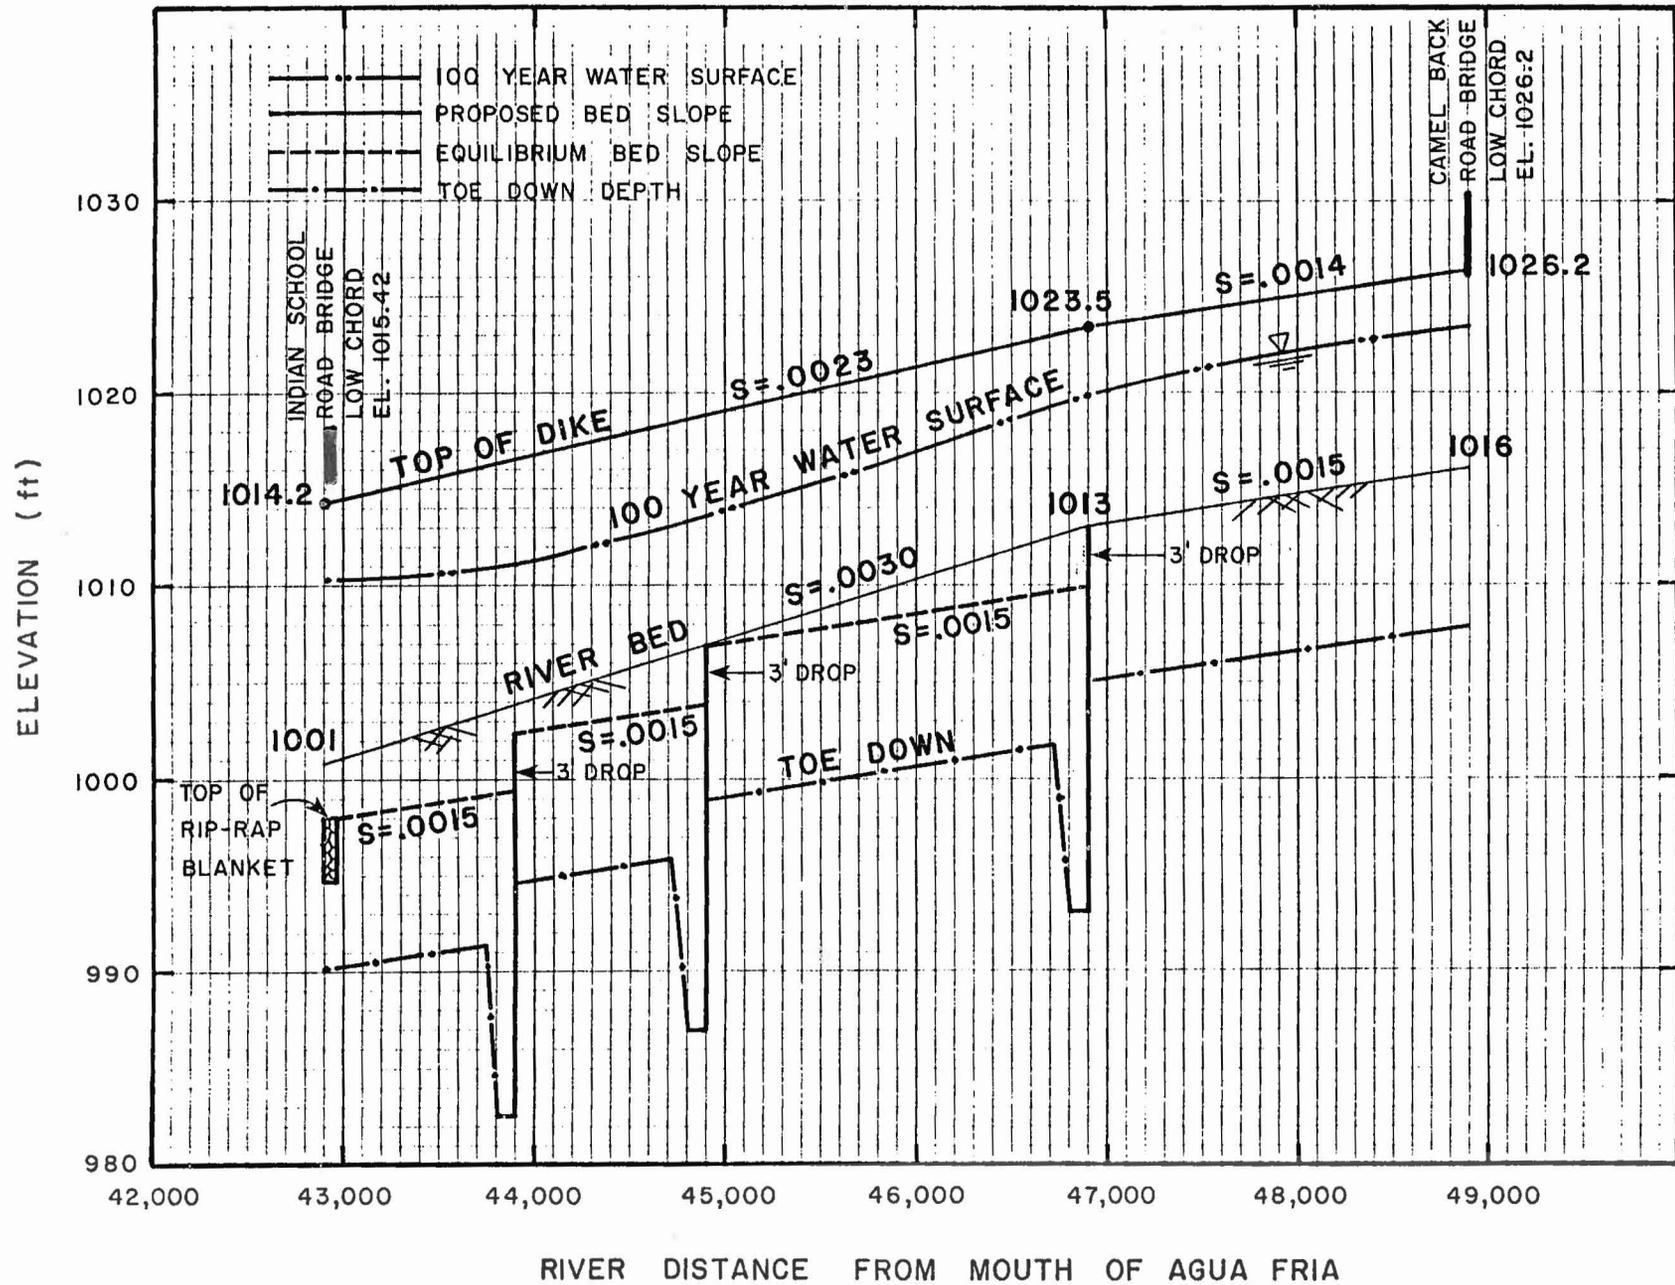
Proposed bed profile, equilibrium bed profile, 100-year water surface elevation, levee heights and toe down depths between Camelback Road and ISRB for Alternative 2.
